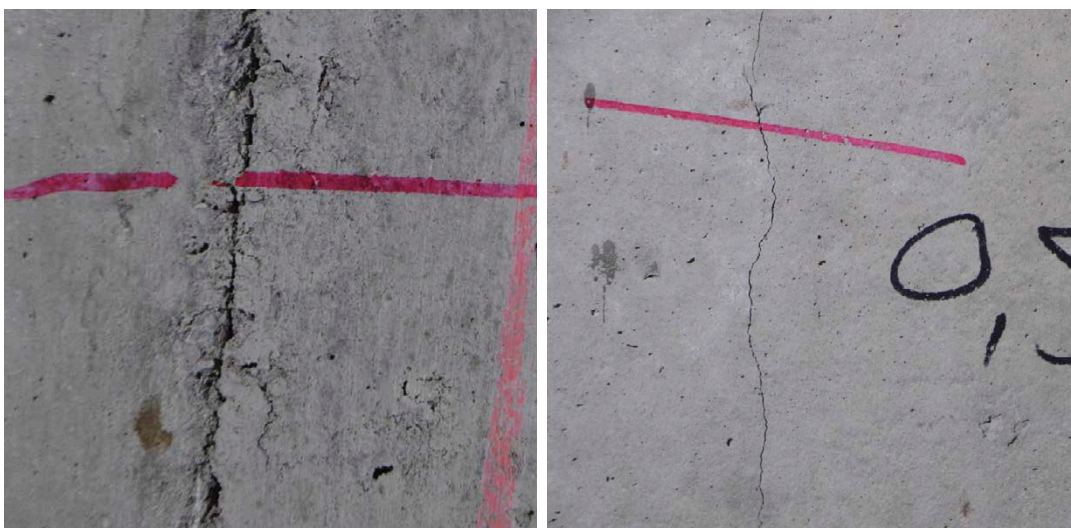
Example of a poorly prepared joint between two adjacent sections (left image) and a crack formed in the centre of a section of the existing outer wall of the concrete structure (right image).
